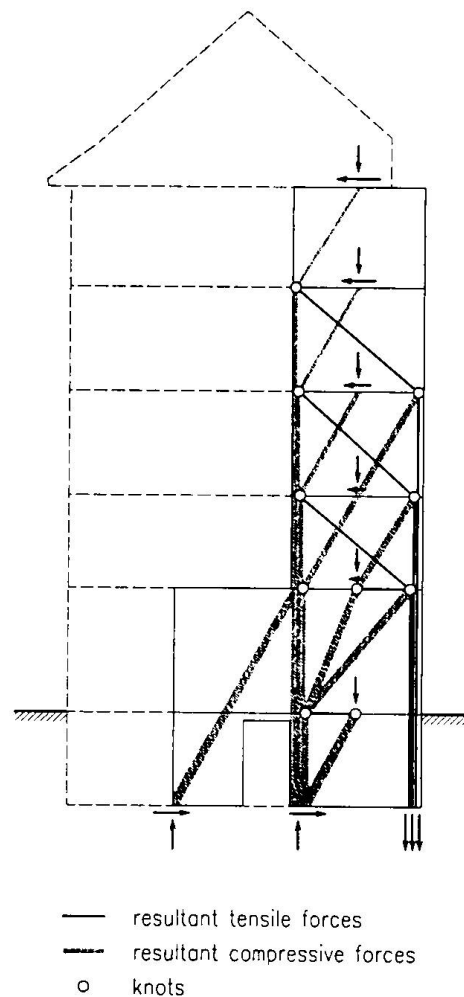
Stress-field of the CFRP-reinforced load bearing masonry wall
